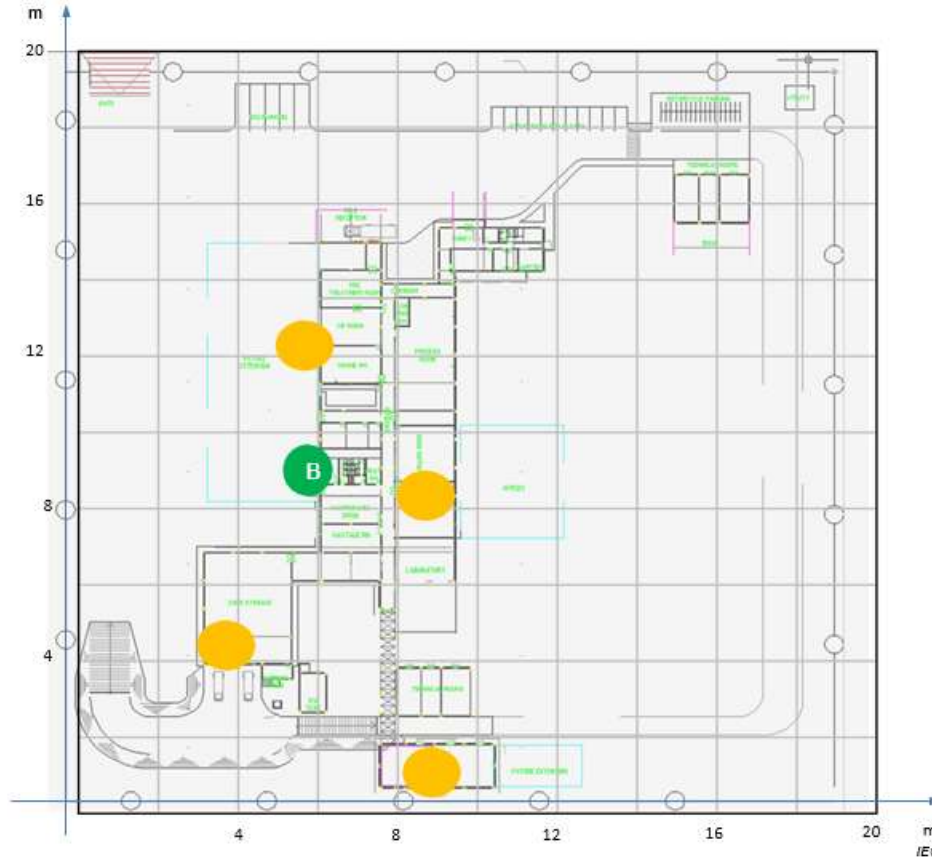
Example 1: Floor plan of production plant with the planned loads and calculated barycentre
